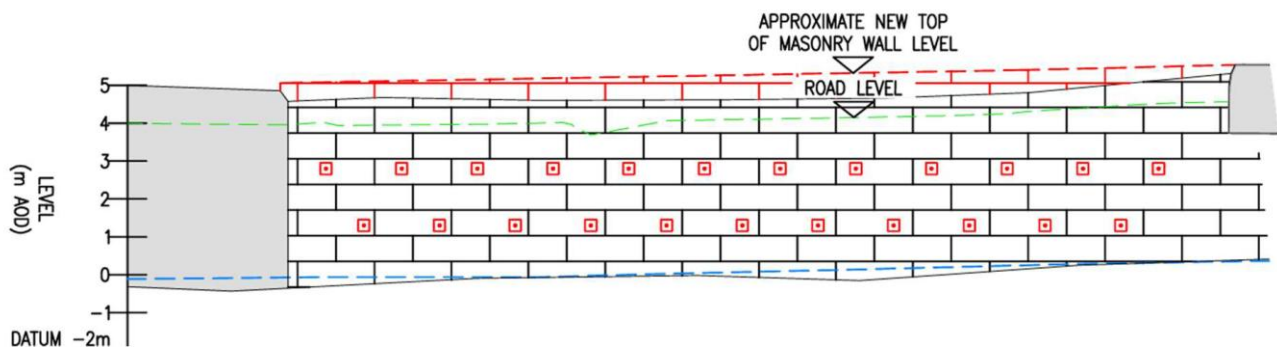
Front view drawing of the retaining wall with marks for anchor contact points
